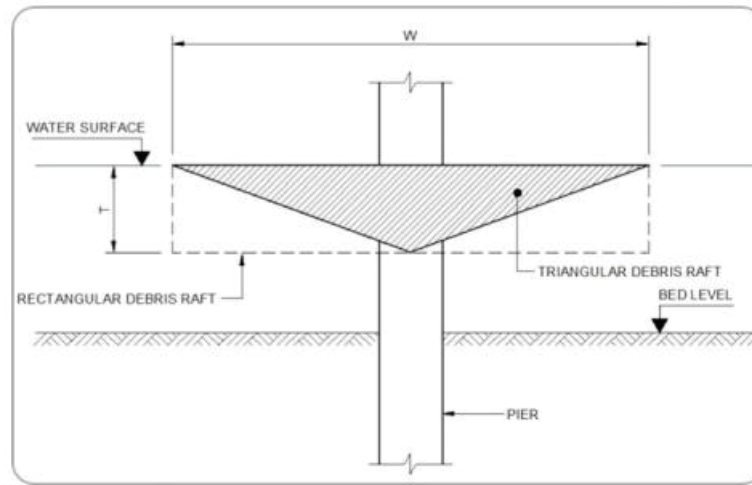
Debris raft loading (Reproduced from Section 2.3.5 Scour in Bridge Manual)
